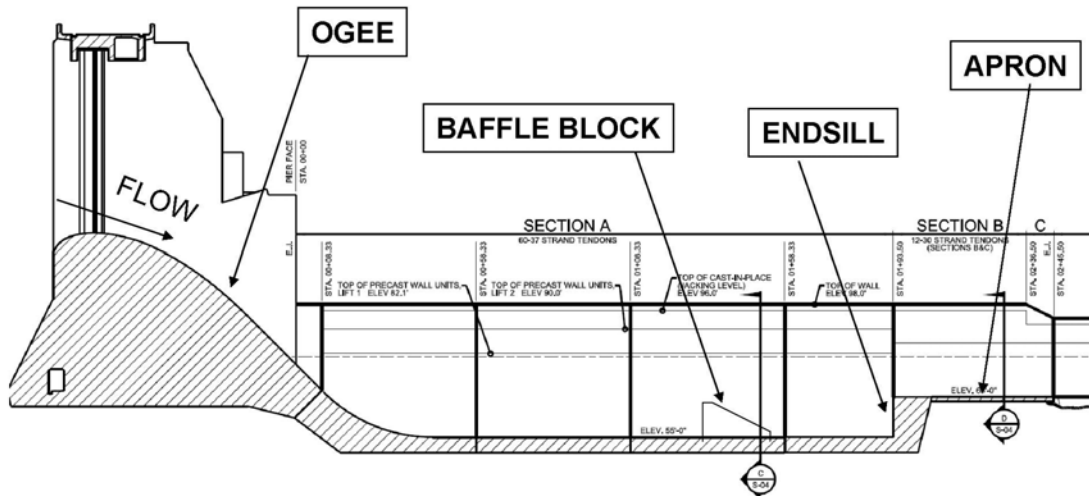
Cross Section of The Dalles Dam showing spillway features.
